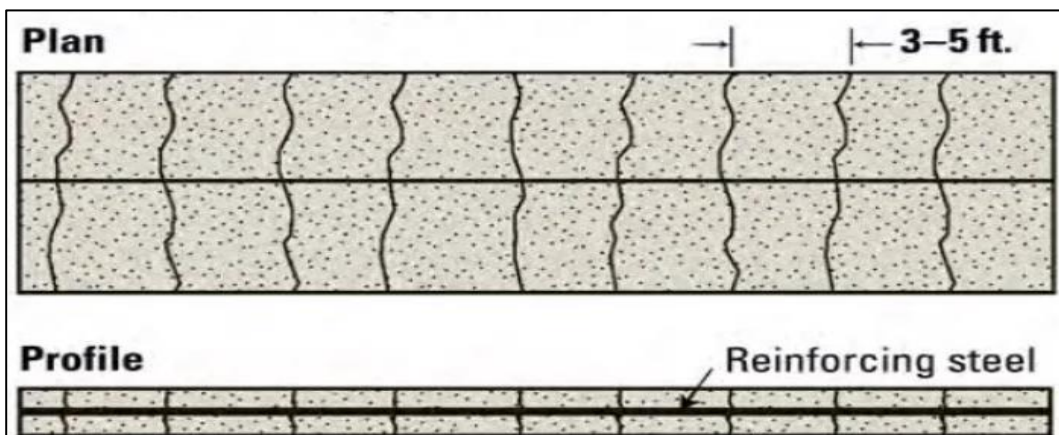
Cross section of Continuously Reinforced Concrete Pavement (CRCP)
